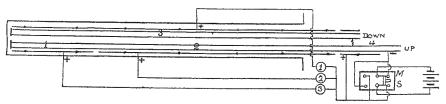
Avoiding crossovers at terminal platforms by sectional wiring.
